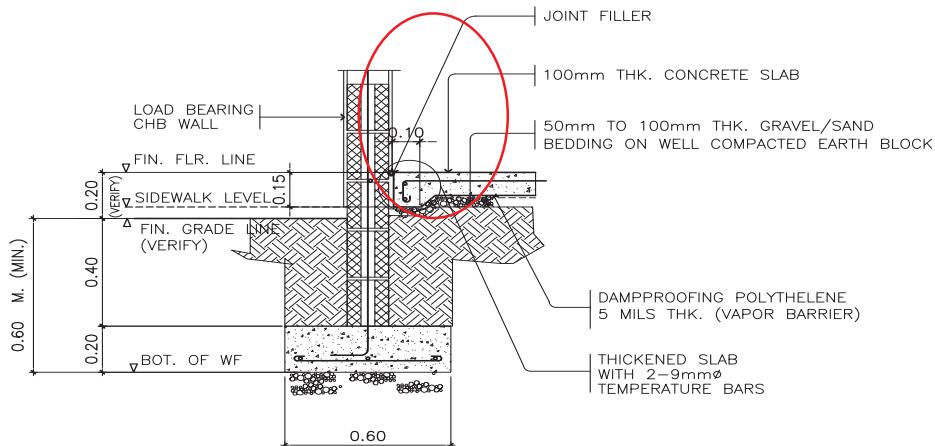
Wall footing detail showing application of joint filler between wall and edge of concrete slab, and the application of damp proofing below slab to prevent moisture seepage, and gravel bed to allow the draining of water.
